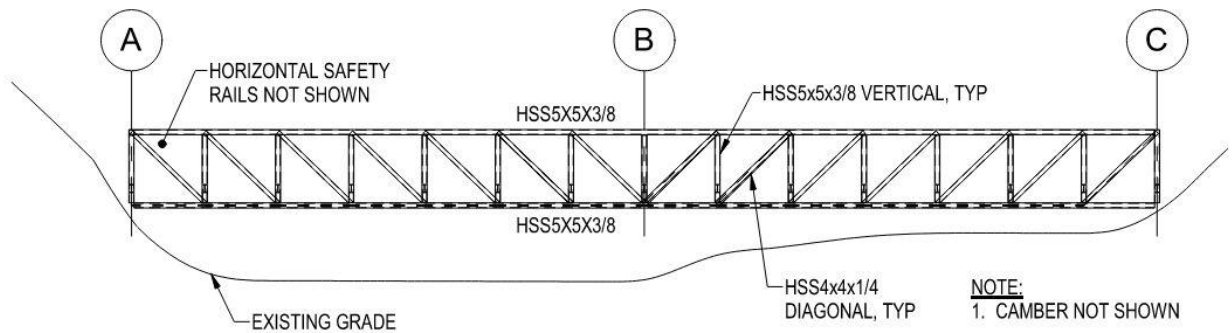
TRUSS BRIDGE ELEVATION, SPAN 84'
